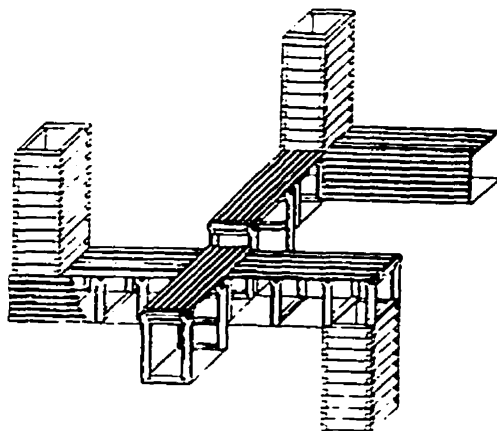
Structure of wooden shafts and tunnels at Tonglüshan, Warring States to Han period.
